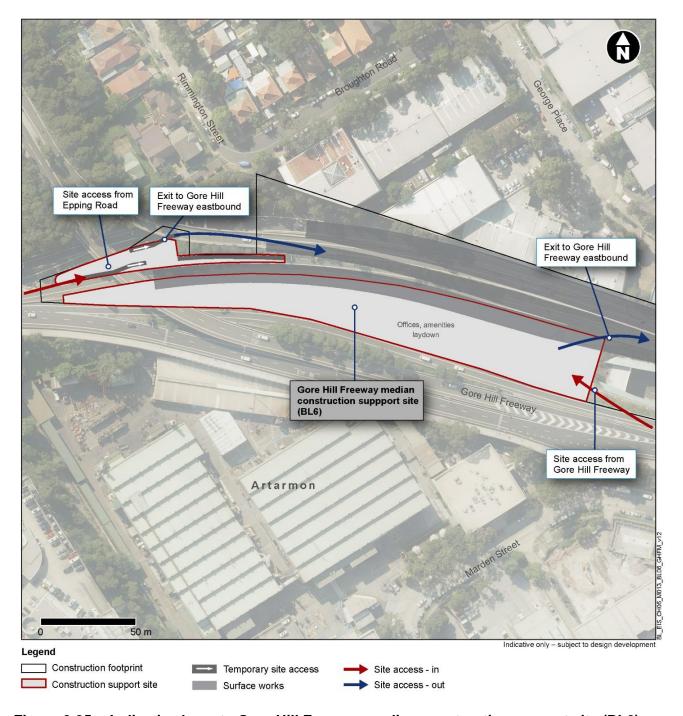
Indicative layout - Gore Hill Freeway median construction support site (BL6)
